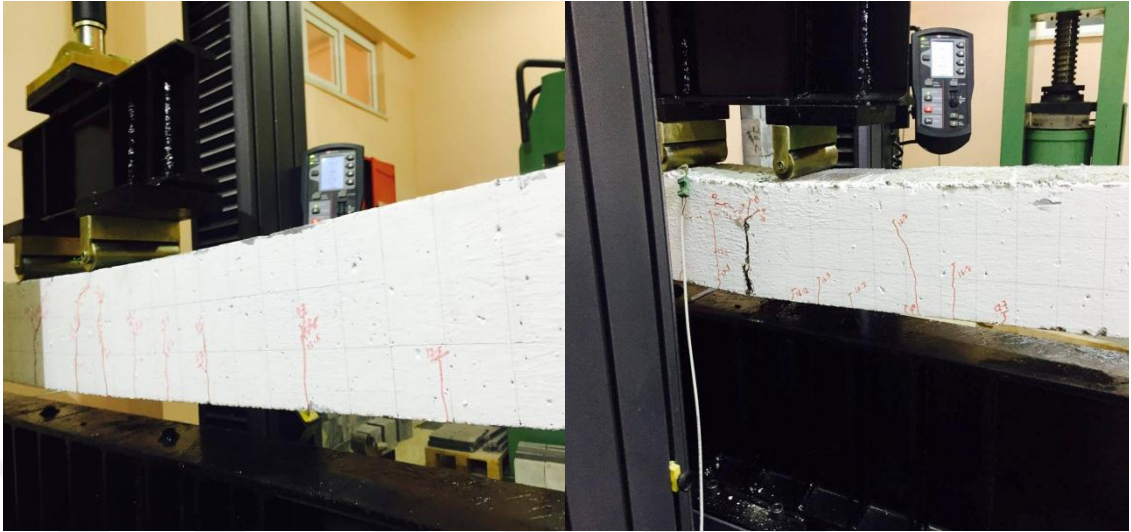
Crack pattern for beam specimen S1-L8-0-3.
